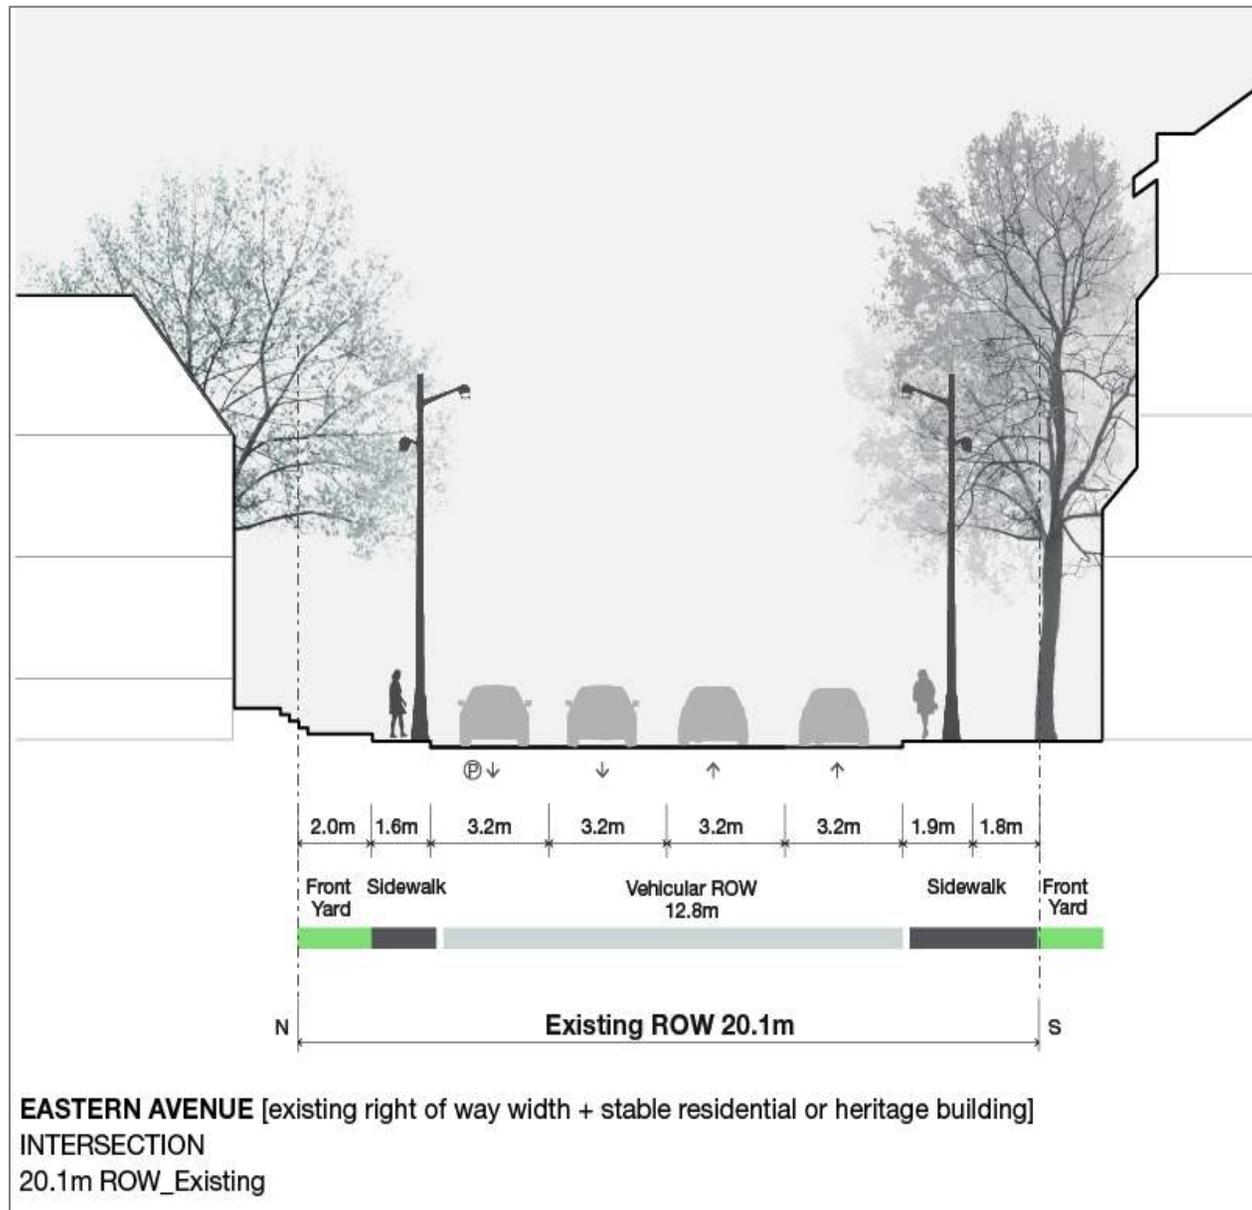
CROSS-SECTION – EXISTING EASTERN AVENUE, EAST OF LOGAN AVENUE
